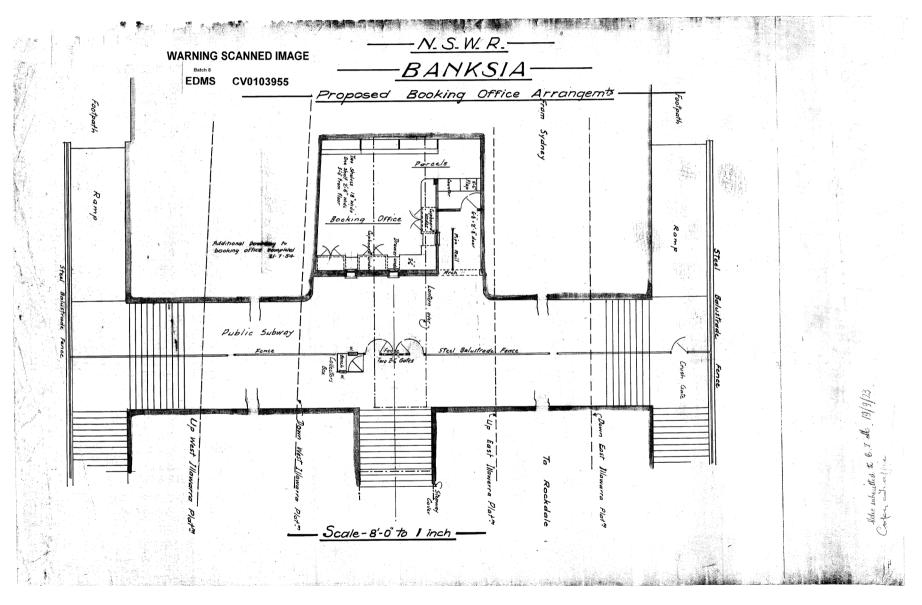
N.S.W.R Banksia – proposed booking office arrangements (subway level) (Source: Sydney Trains plan room)
